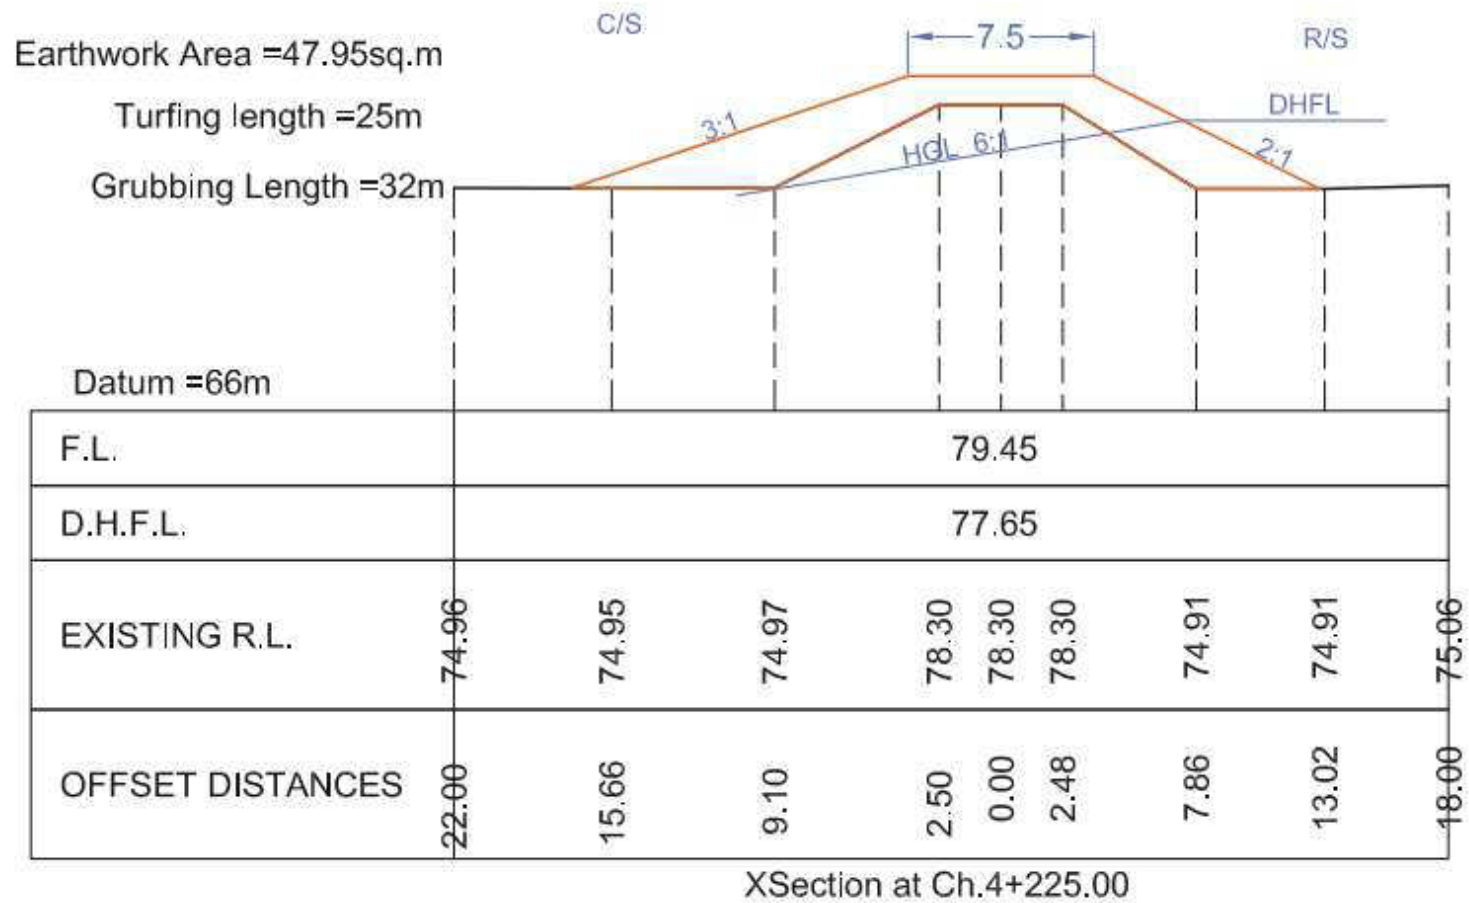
Typical Cross-Section of the Proposed Bank Protection Works under the Kaziranga Subproject
